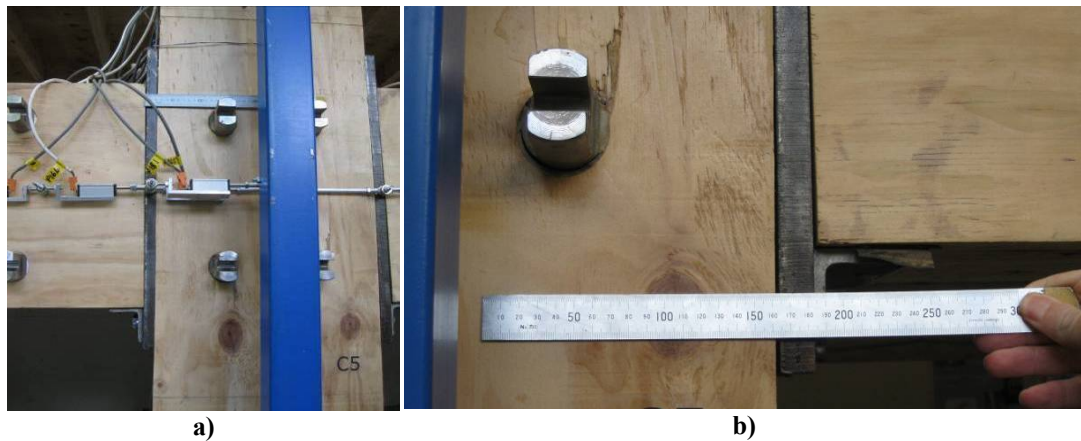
L2 BC connection gap opening at 2% Drift a) S column b) S column, east side
